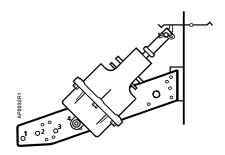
No. 6 Actuator Frame Mounting, Normally Open Damper.
